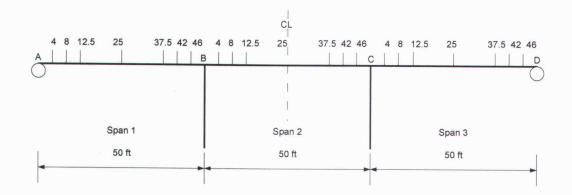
Profile view of McKenzie River bridge with cross-section locations (feet).
